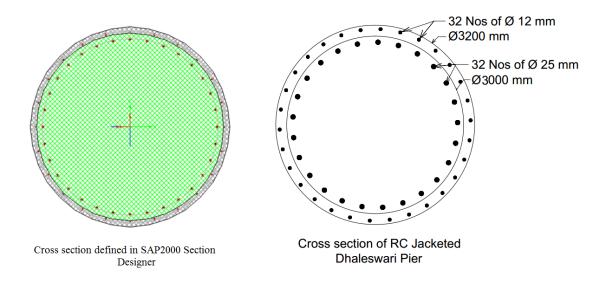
Cross section of the pier after the reinforced concrete jacketing
